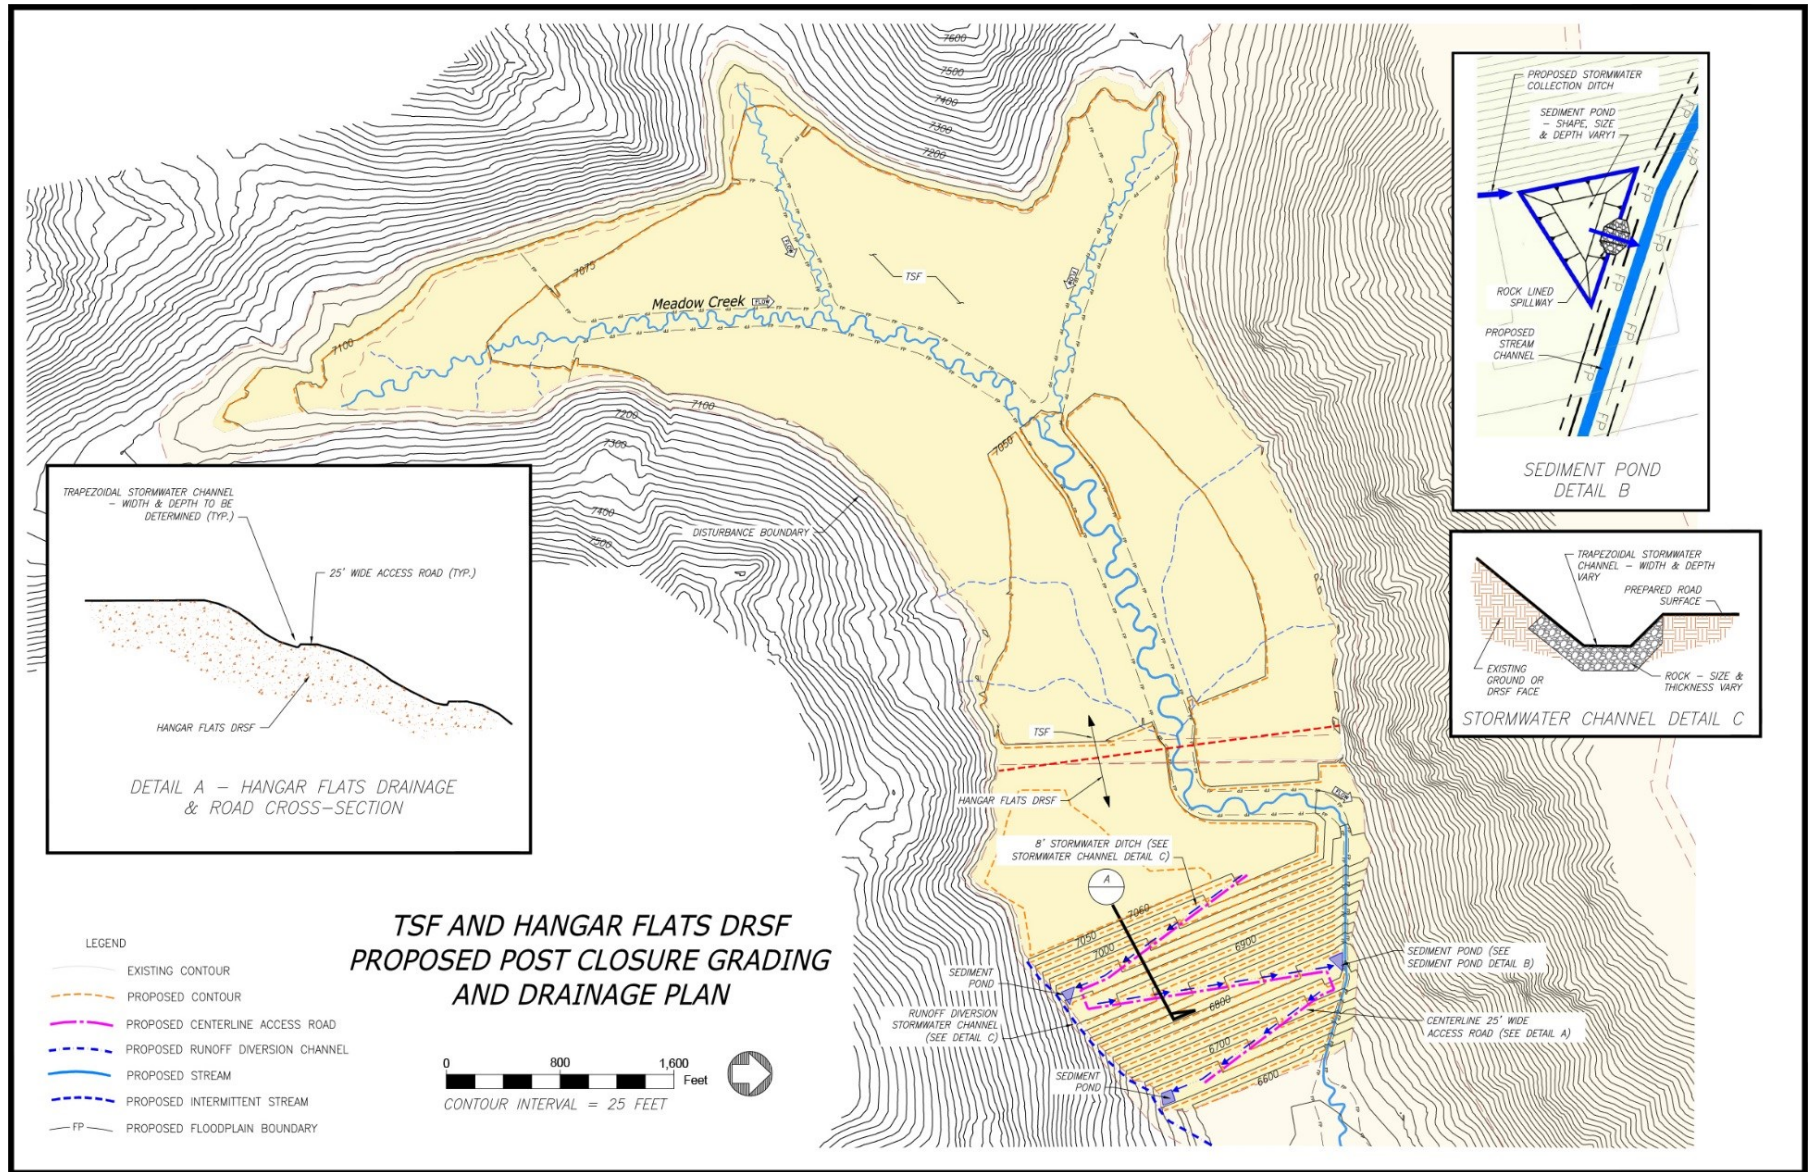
TSF and Hangar Flats DRSF grading plan
